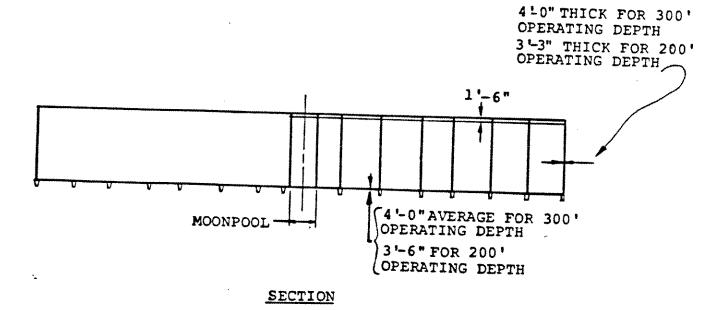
TYPICAL STRUCTURAL ARRANGEMENT OF SUB-BASE
